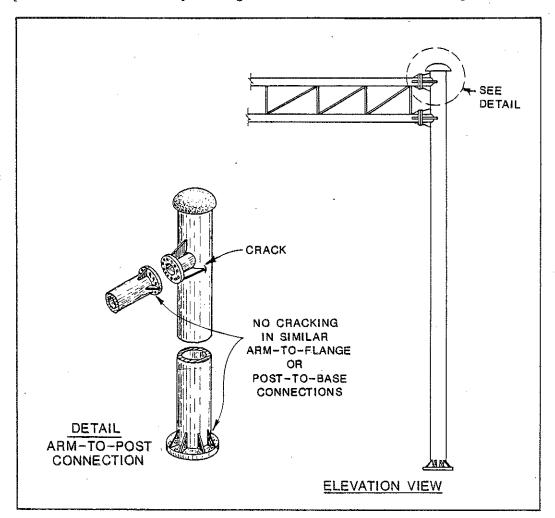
Hairline crack location near horizontal gusset plate.
